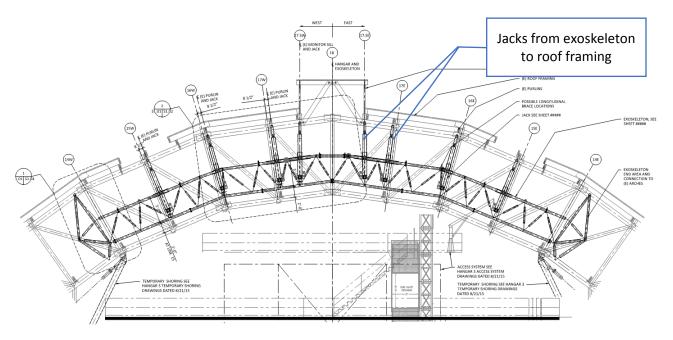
Exoskeleton Elevation (Preliminary Drawings)
